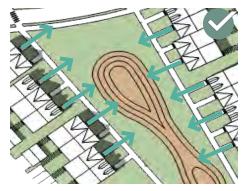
In multi-family development, place buildings to maximize common spaces shared between units.
